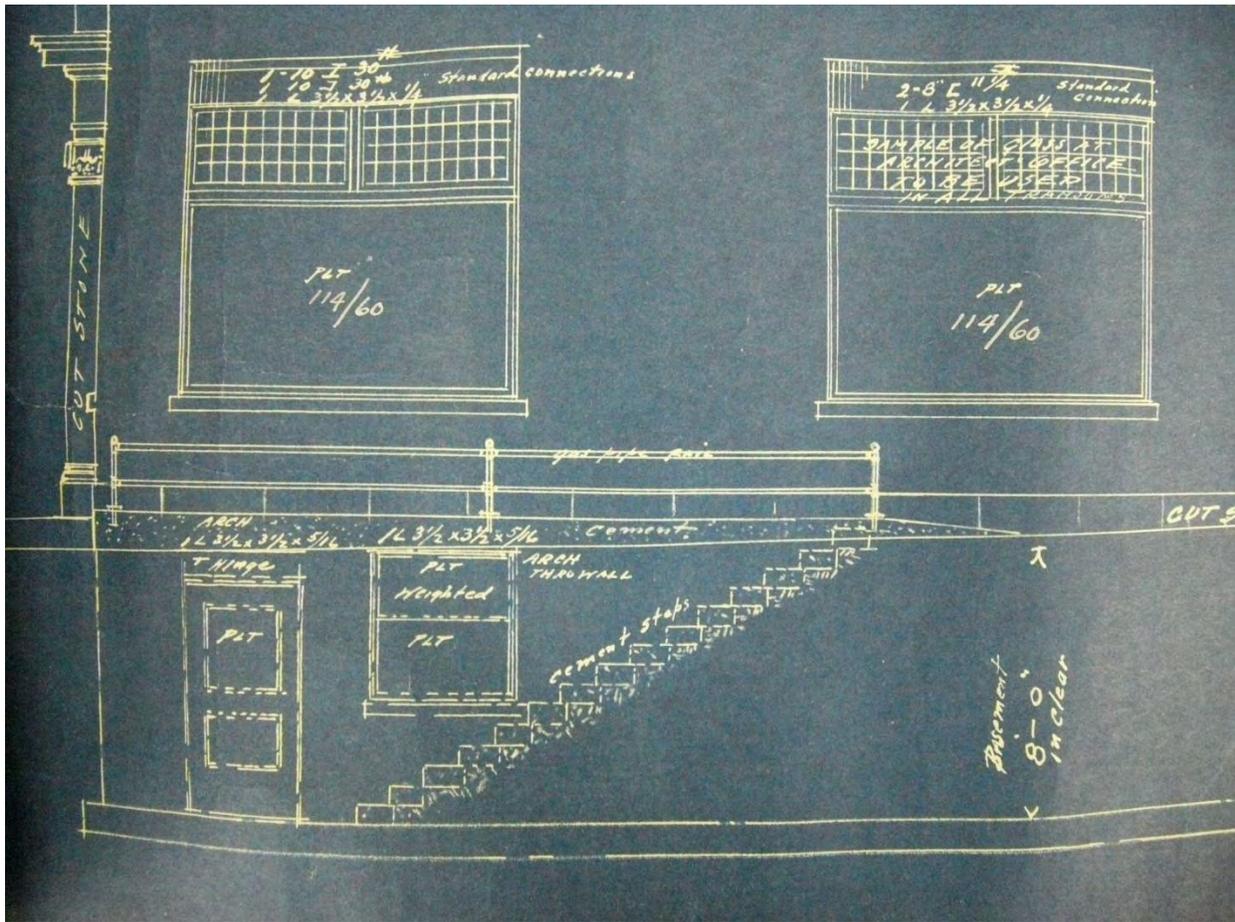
42nd Avenue North elevation, detail of the entry to the Pool Hall / Club Room area, source: Northwest Architectural Archives
